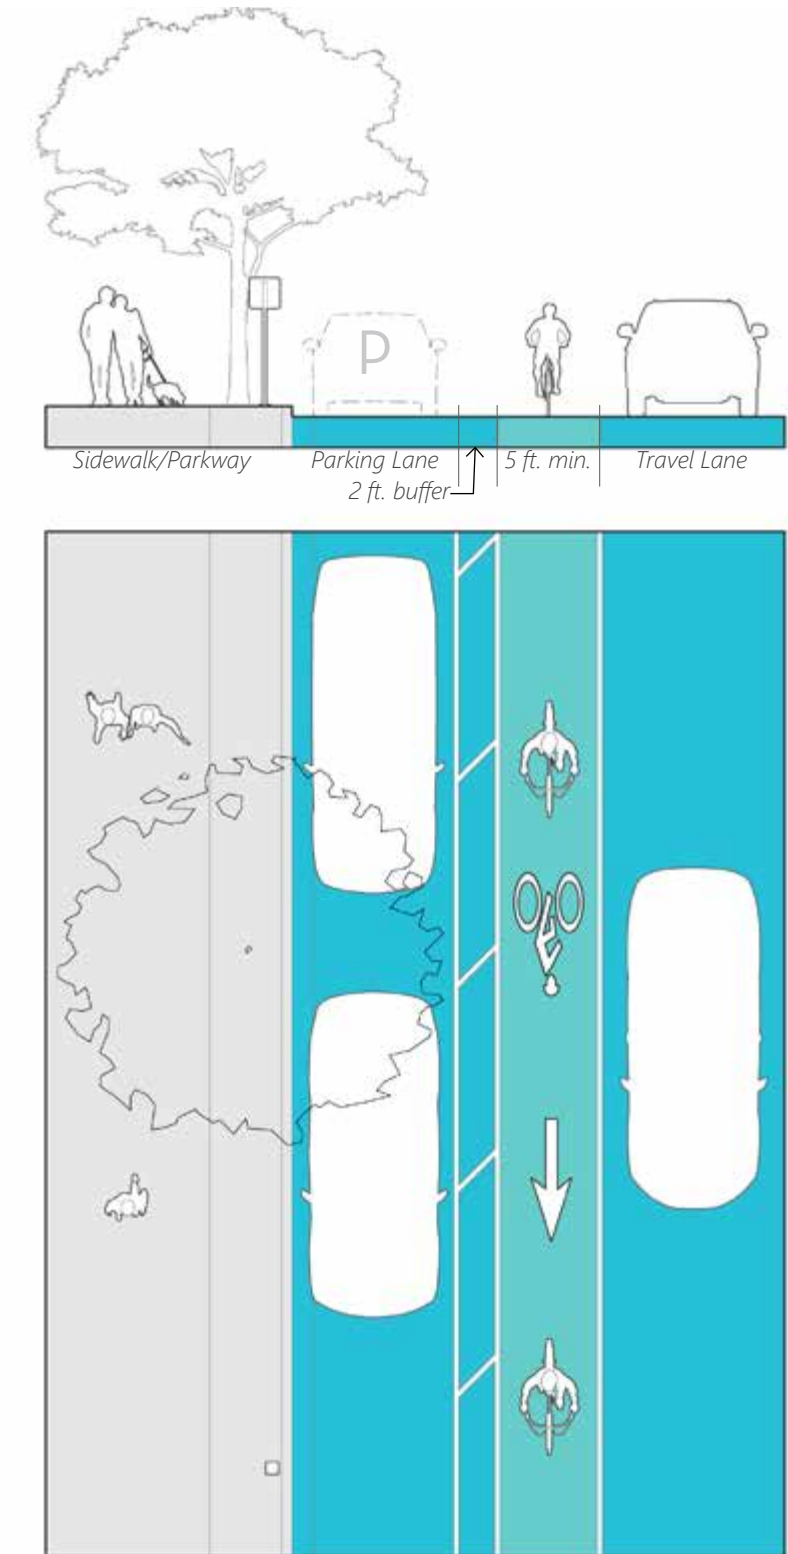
Typical Class II Bikeway, Buffered, On-Street Parking Adjacent.
